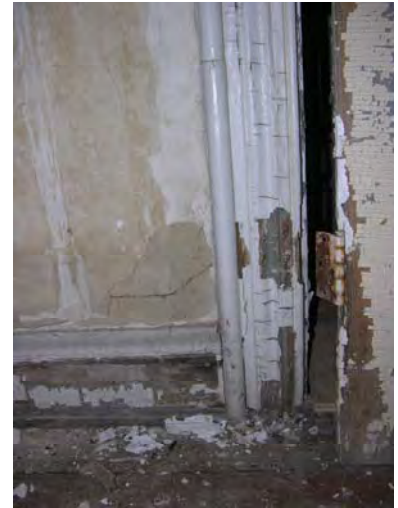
Water damage at wood base on north wall. (Photo: BBB, 2007)
